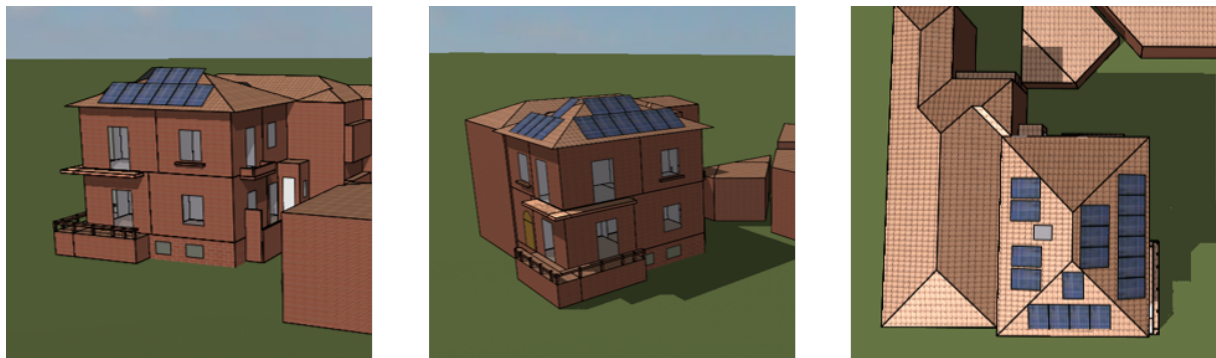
PV installation and arrangement in the 3 roof sides.
